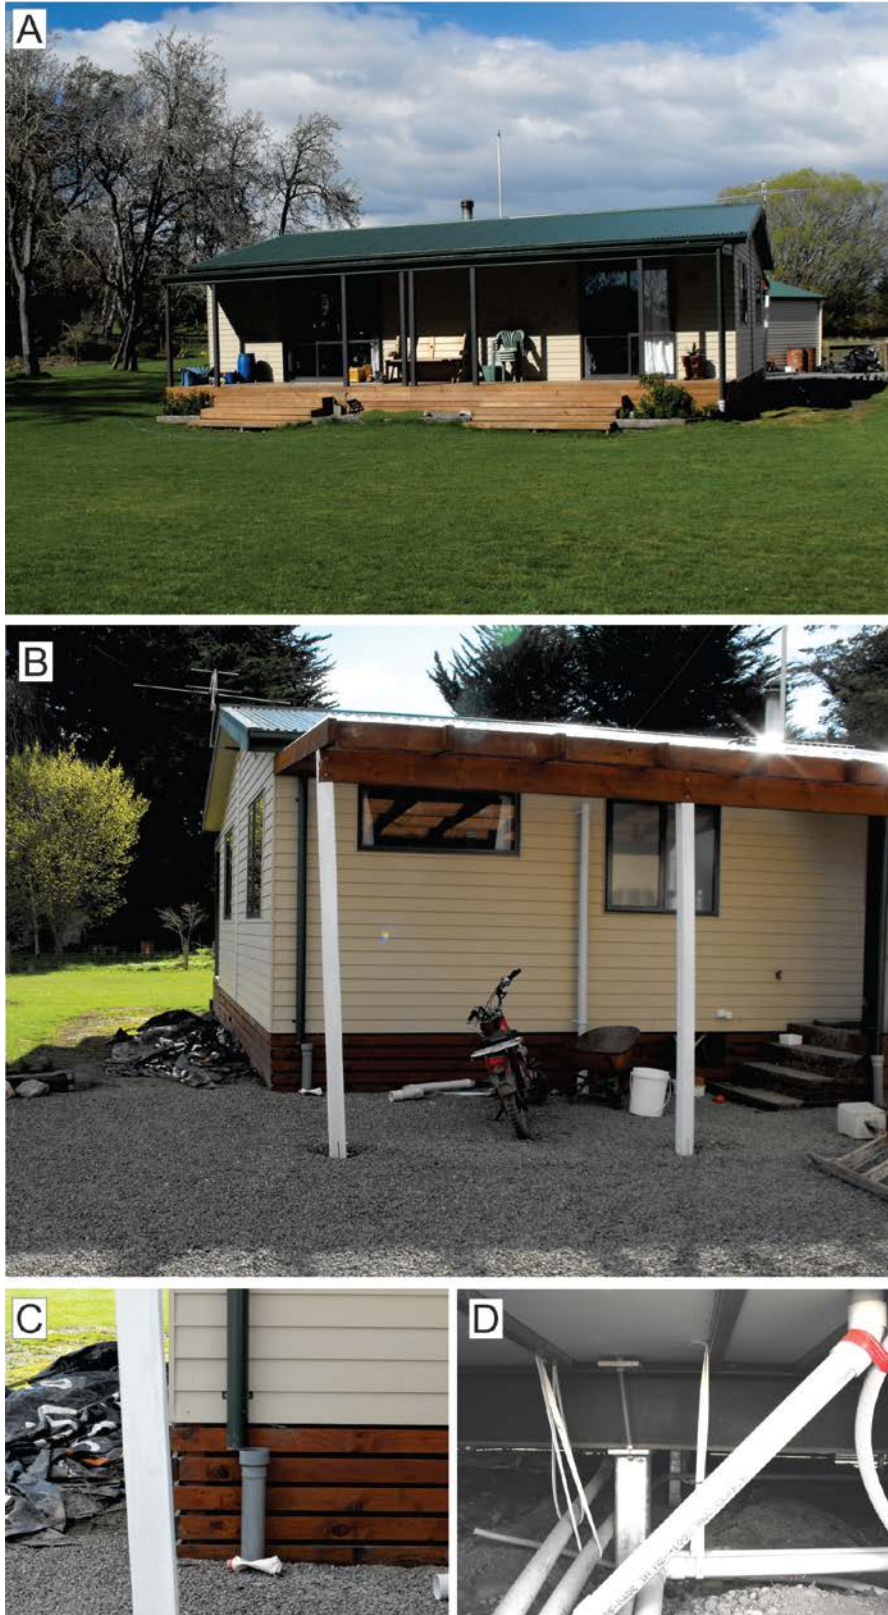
Gillanders Road house and Greendale Fault surface rupture; see Figure A2.7 for location. (A) View looking east. (B) View looking northwest. (C) Close-up of detached down-pipe on east-southeast side of the house. View looking west-northwest. (D) Close-up of pile, bearer and deformed bolted connection. View looking west-northwest. Photos by Russ Van Dissen.
